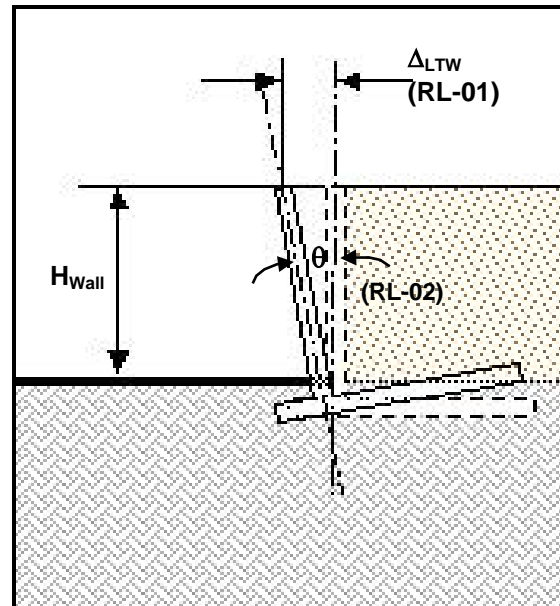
, Fill ERS Section C-C Lateral Deformations
